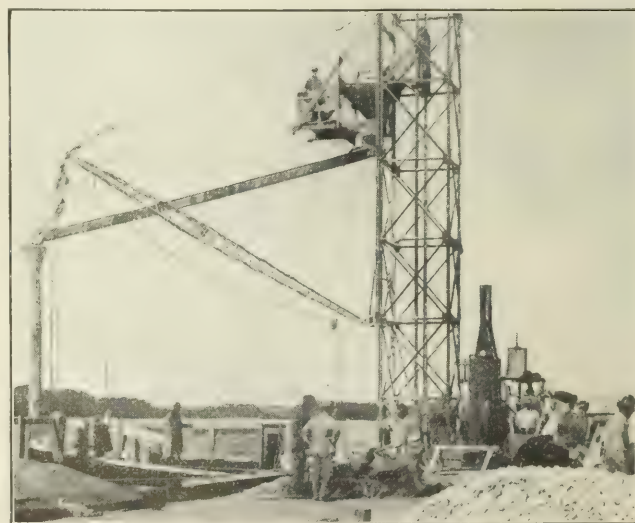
TREMIE CONCRETING IN CRIB OF PIER 4
